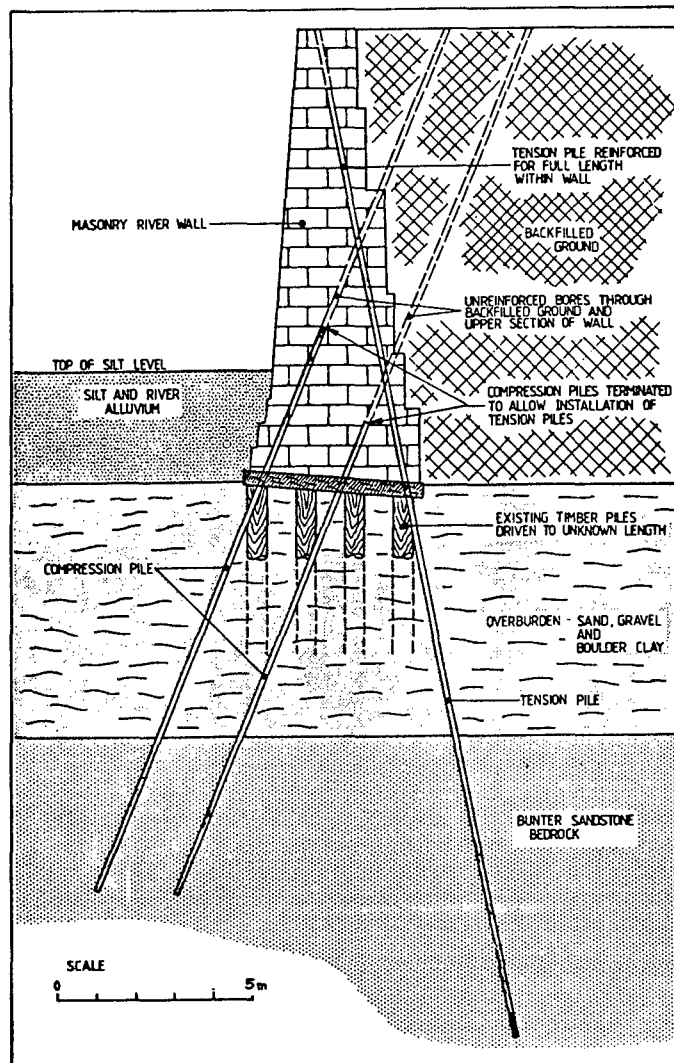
Typical cross section of reinforced and underpinned retaining wall at Albert Docks, Liverpool, United Kingdom (Turner and Wilson, 1990).
